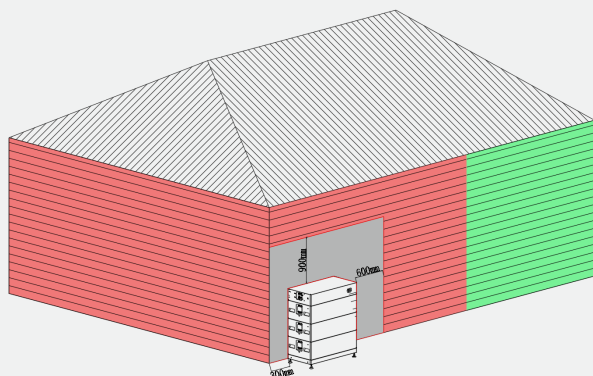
elevation 2 – 300mm from the corner of a non-habitable room
